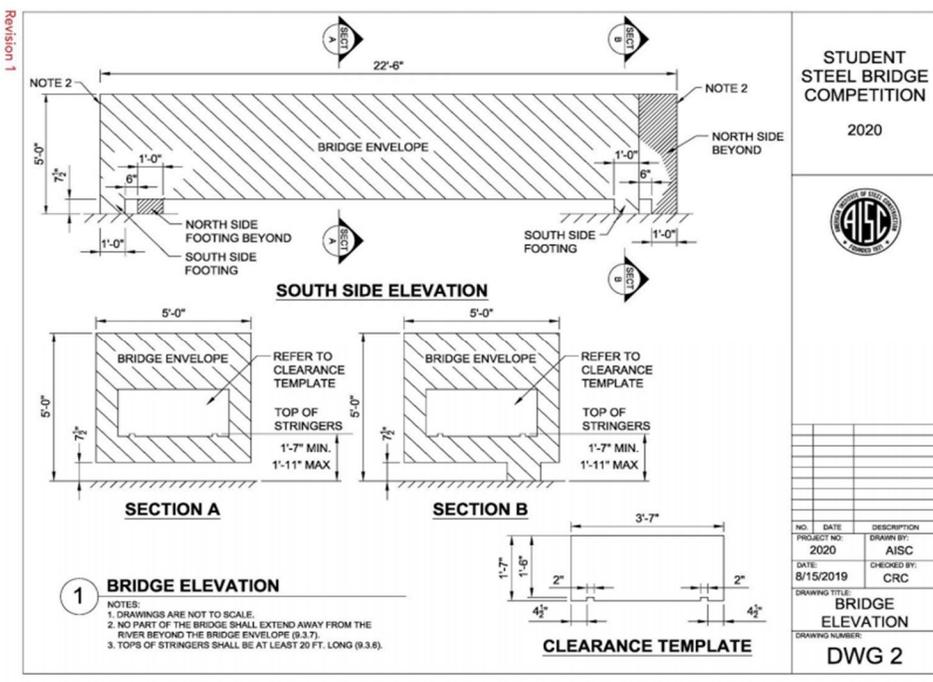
Cross Sectional View of Bridge Elevation and Envelopes
